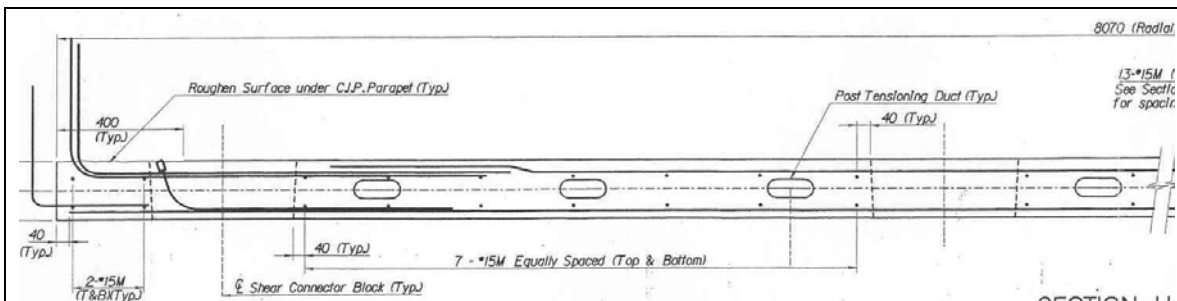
Typical deck transverse reinforcement for a bridge in West Hartford, CT (CT-DOT, 1997)
